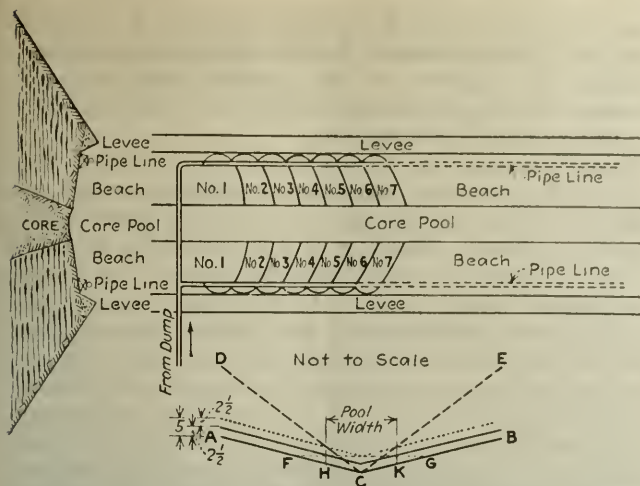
DIAGRAM OF EMBANKMENT BUILDING PROCESS
